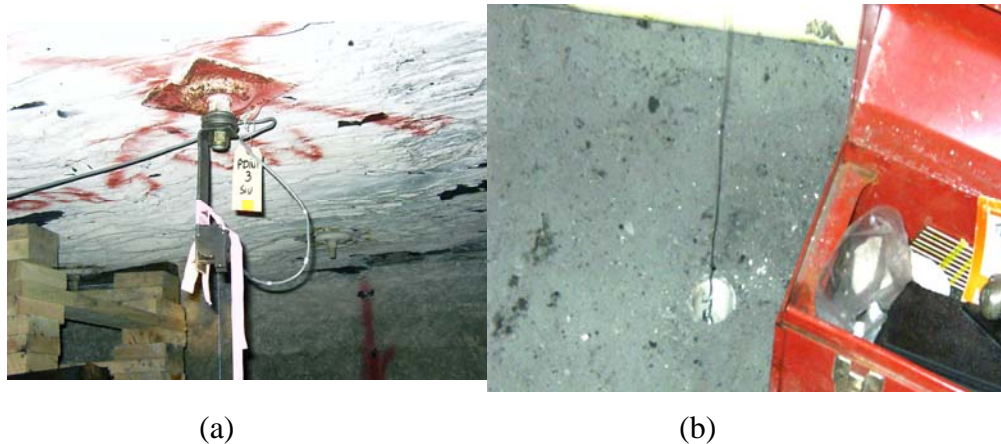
Wire extensometer attached to (a) roof bolt anchor, and (b) floor anchor in a roof-to-floor convergence monitoring station.
